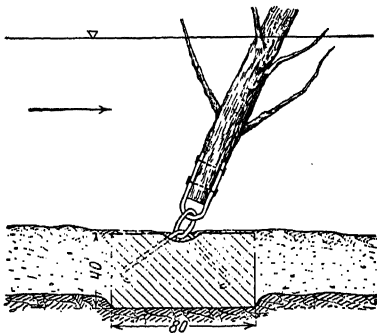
Dip-trees showing method of fixing tree to concrete block
